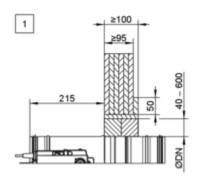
Dry mortarless installation into a timber wall or CLT wall, with a fire batt
